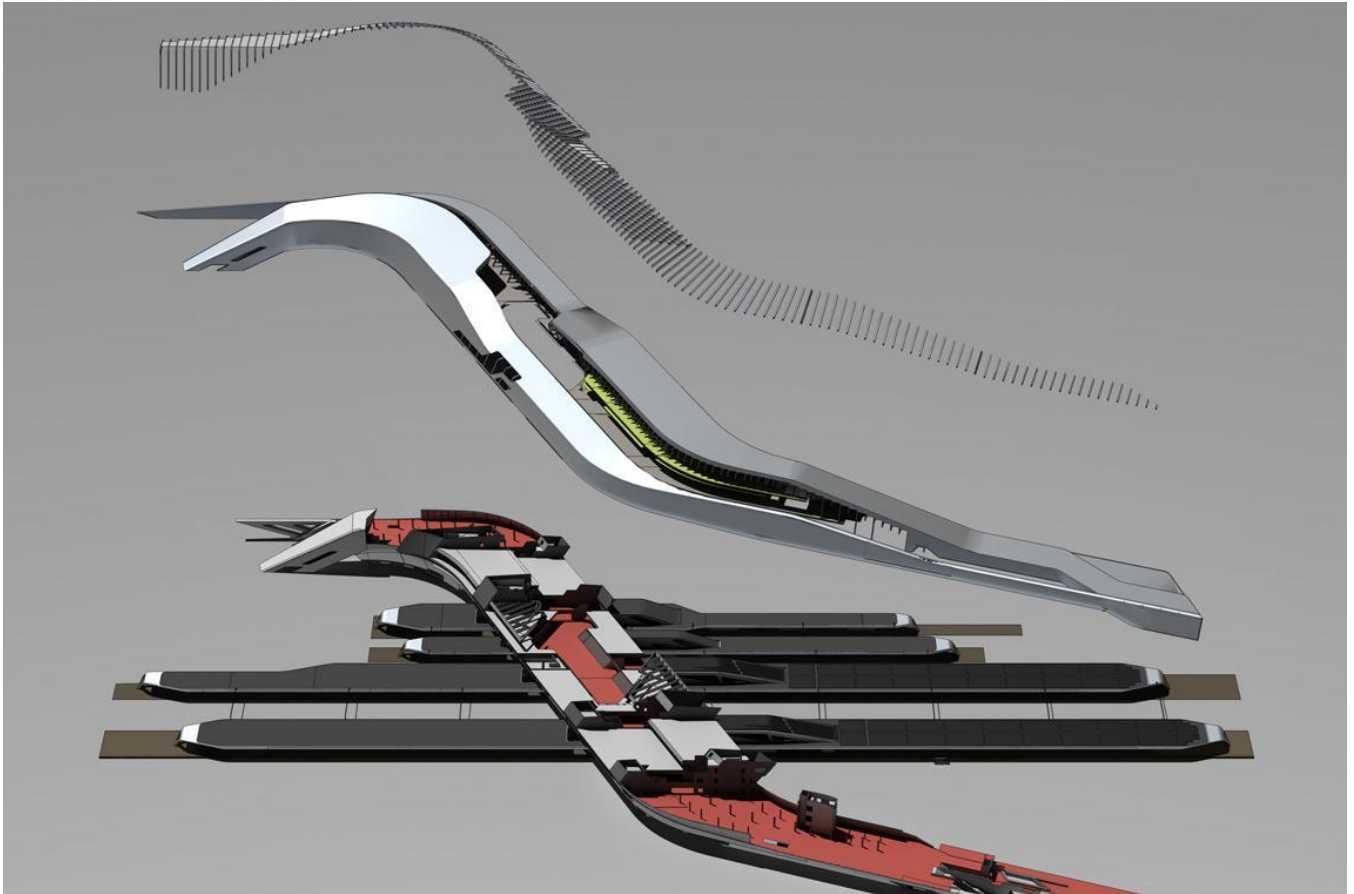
Axonometric View showing the platform, atrium space and the roofing structural system
